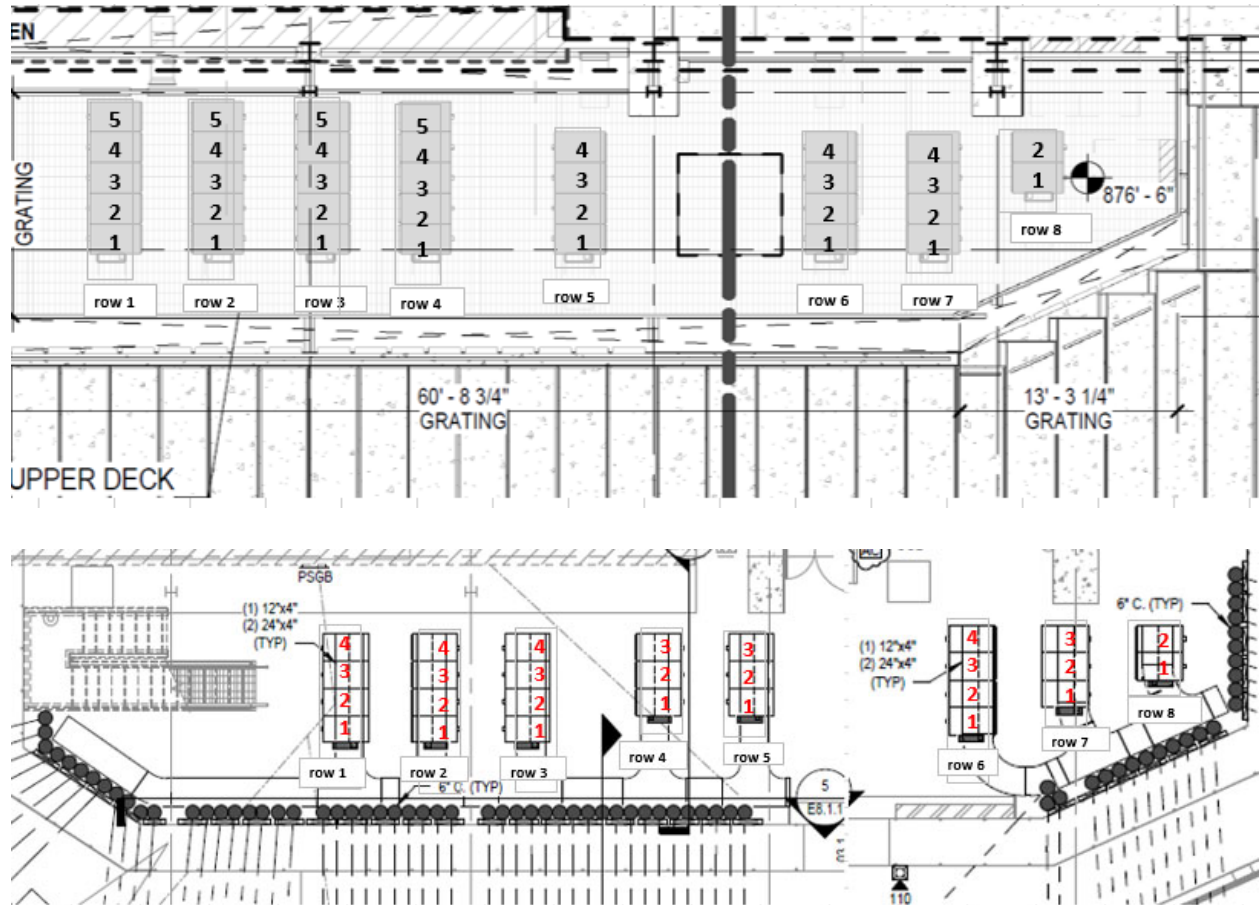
(top) Rack layout at the mezzanine level, providing space for 38 racks. (bottom) Rack layout at the ground floor level, providing space for 25 racks.
